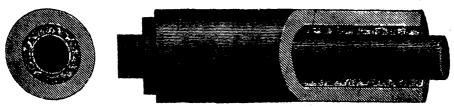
Use of Mineral Wool Inside of Wooden Collars. Plan Pursued by the New York Steam Company with its Underground Pipes.
